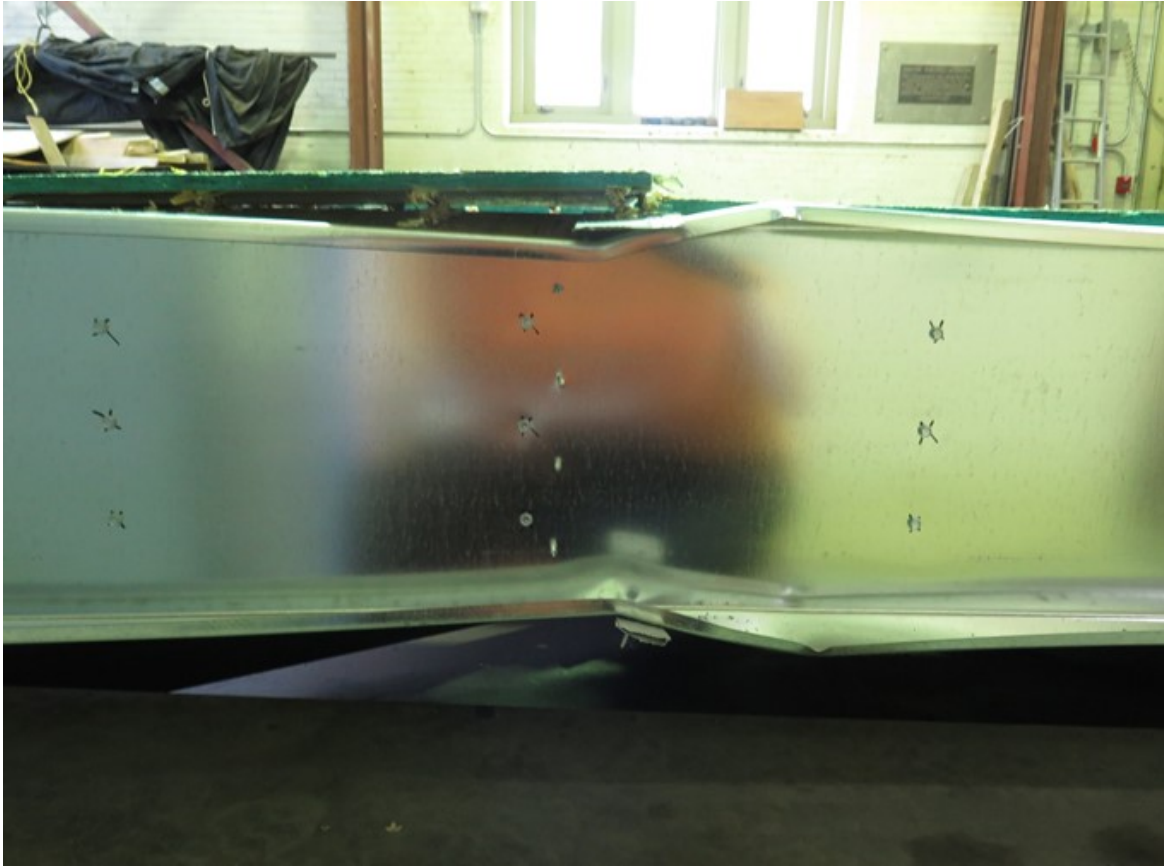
Bending of CFS Joist at Hinge Location Created After Sheathing Failure
